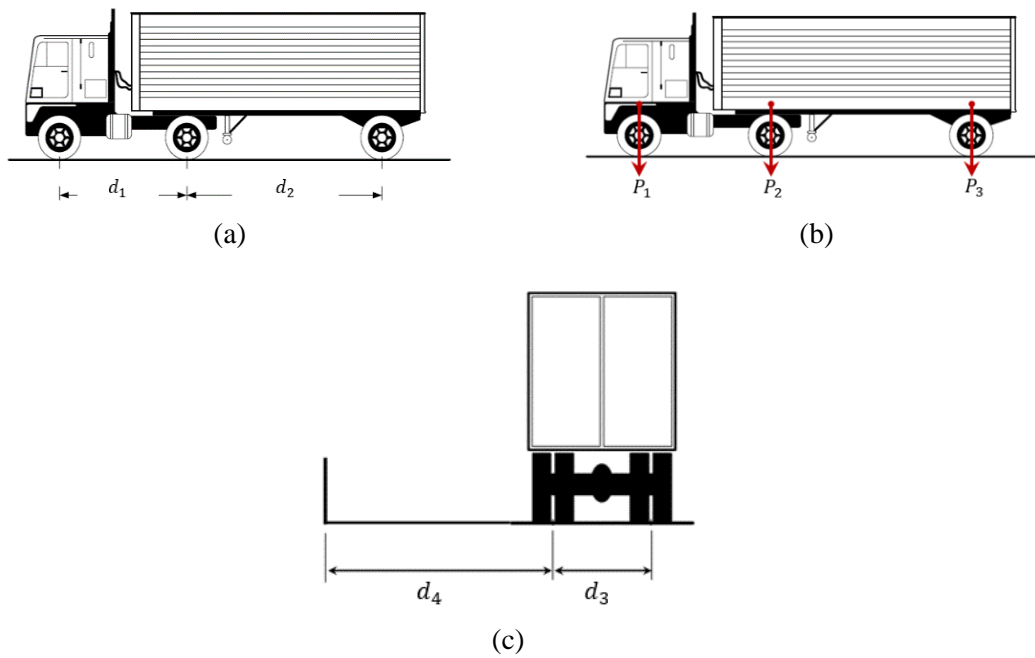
Specifications, dimensions, and installation of HL 93 truck
